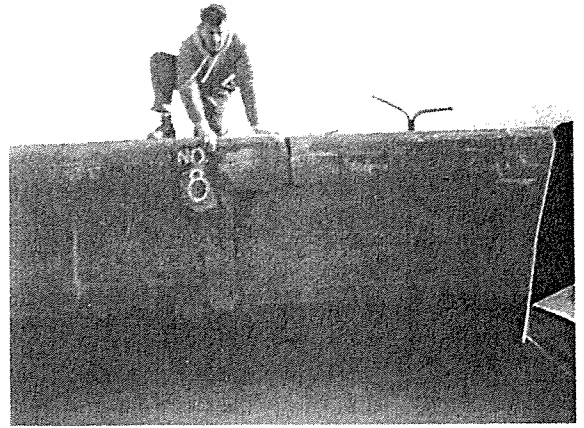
View from lake side of section of pier from Sta. 5+00 to 5+20. Here, only superficial signs of deterioration are evident.
